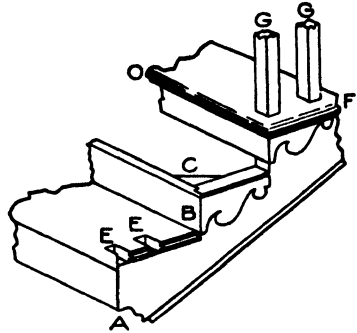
Portion of a Cut and Mitered String, Showing Method of Constructing Stairs
